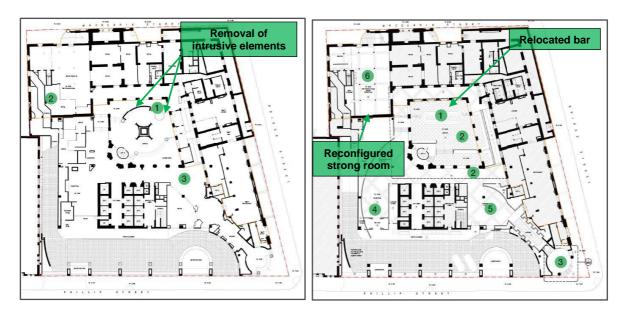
| Existing and proposed ground floor works (Source: Applicant's Design Statement)
